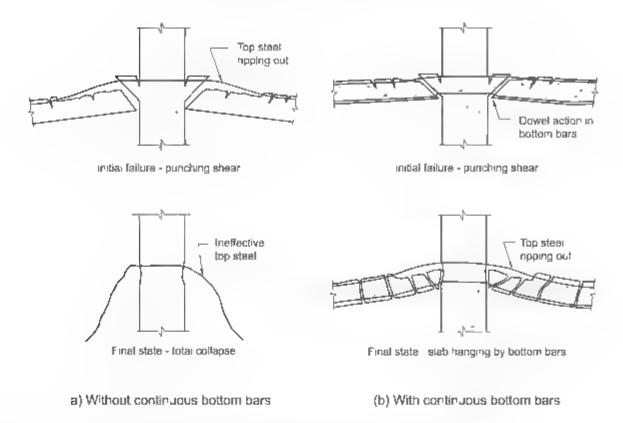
9b—Catenery action of bottom flexural reinforcement after punching failure
